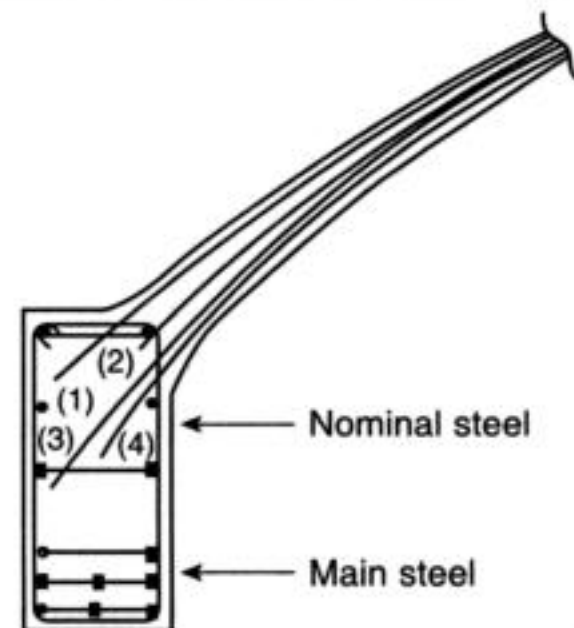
Detailing of edge beam of long shells with steel fabrics:
